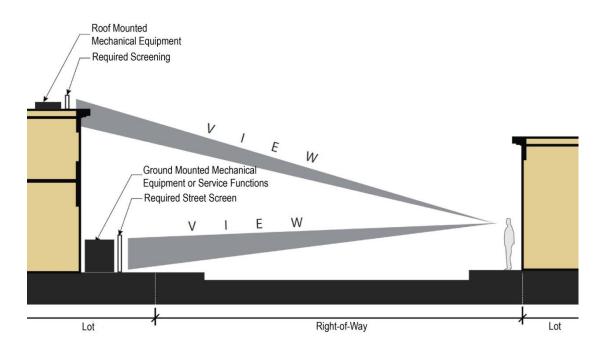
Illustration showing required screening of roof and ground mounted equipment.
